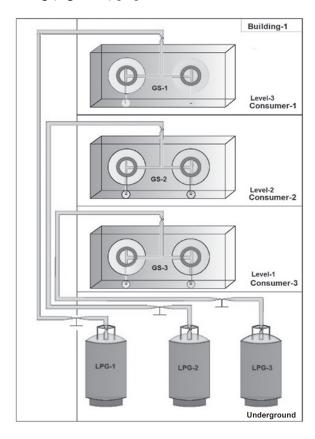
Clustered LPG distribution layout for multiple consumers in a single building (Underground or Ground Storage)
